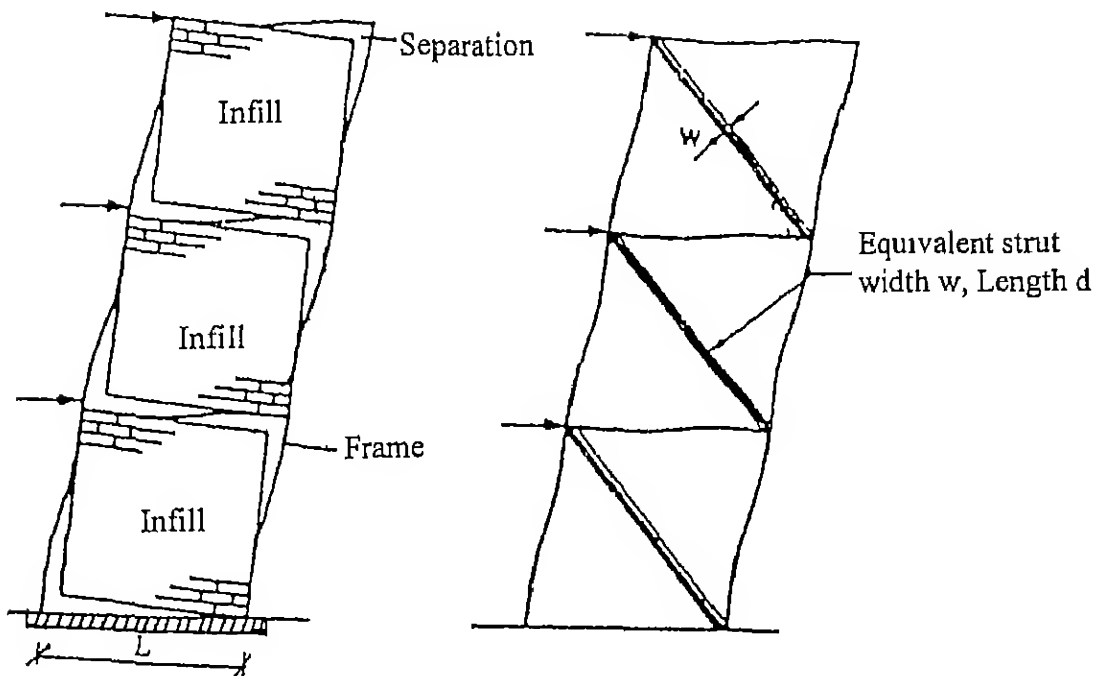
Separation between infill and RC frame member and strut action in infill (Drysdale *et al*, 1993)
